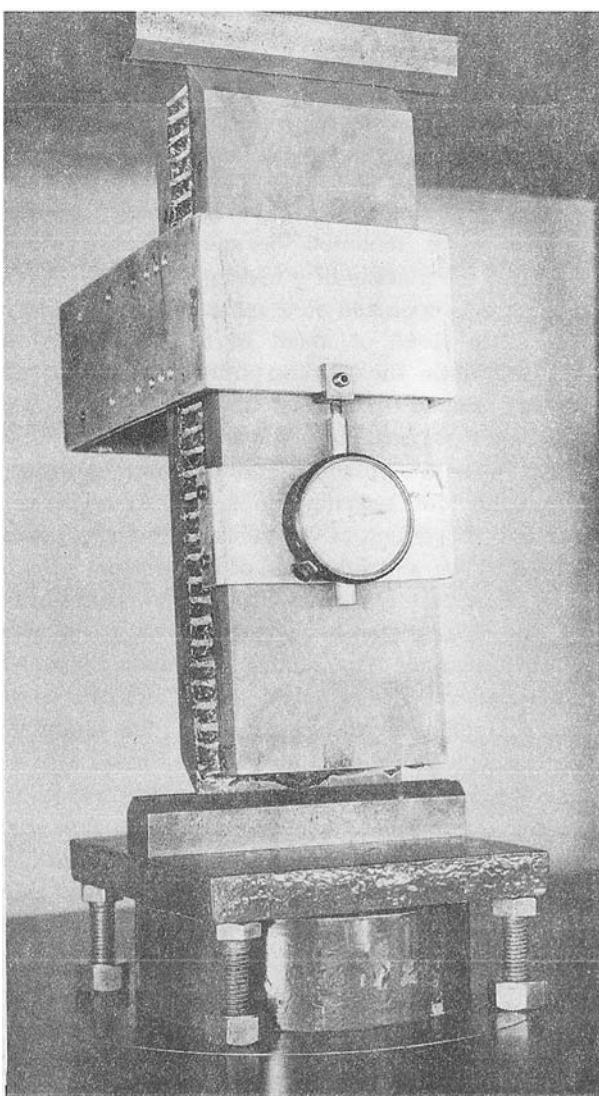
Core shear apparatus showing specimen with attached loading plates, spherical base, and collar and dial gage used to measure deformations.
